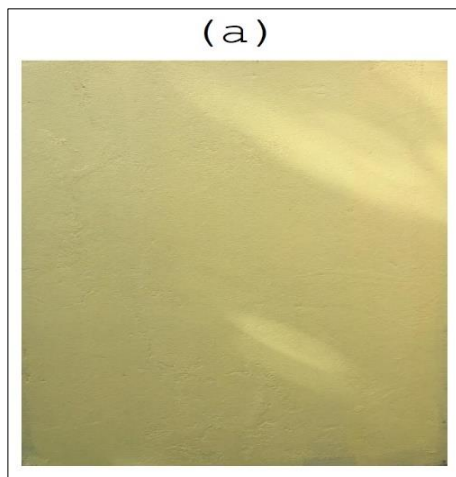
(a) Masonry wall after 1 year of observation. Source: Authors, (2020).
